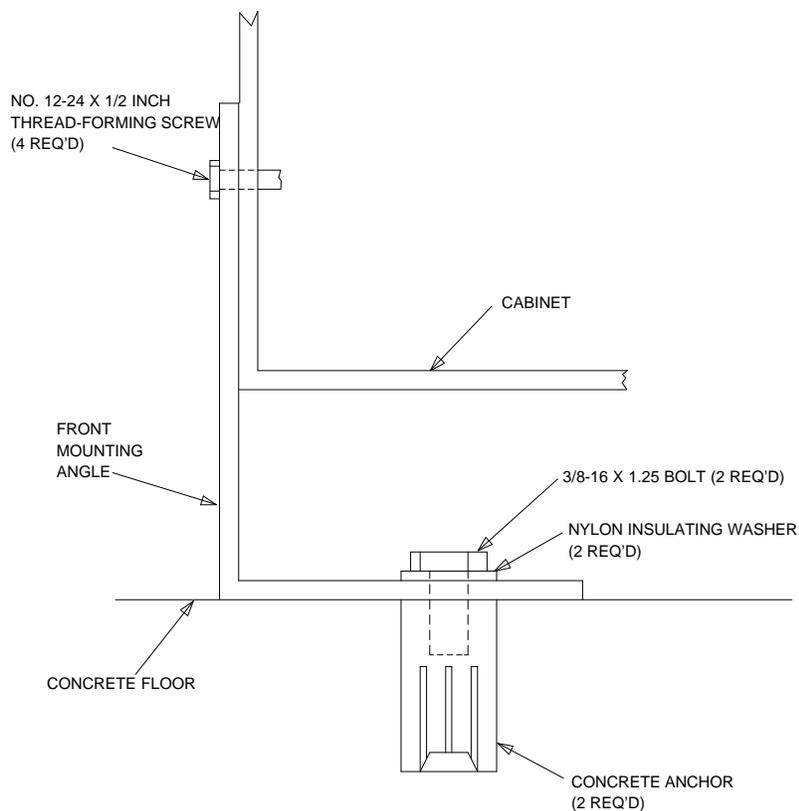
Cabinet Earthquake Mounting — Concrete Floor
